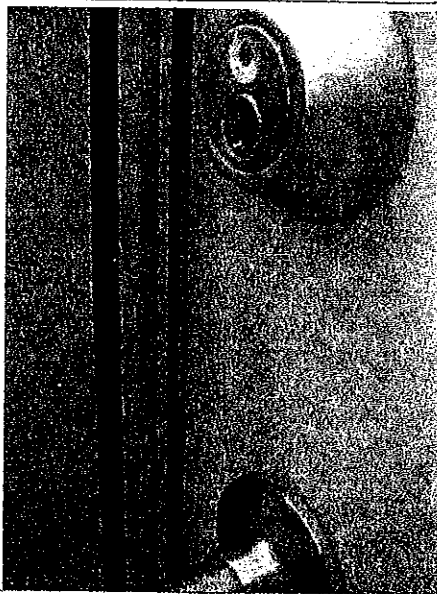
Poorly fitted weather-stripping at Townhouse 4 rear door.
